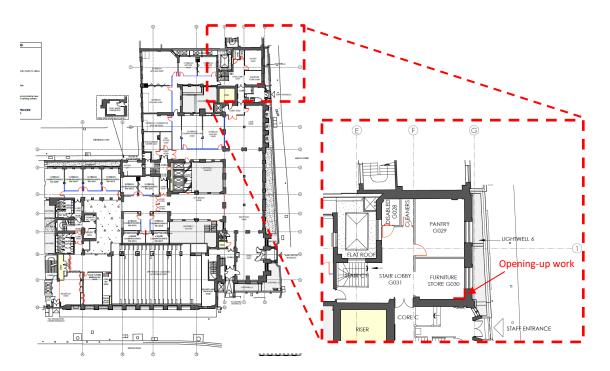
Location of Intrusive Survey within Storage Room at Ground Floor Coring Investigation
